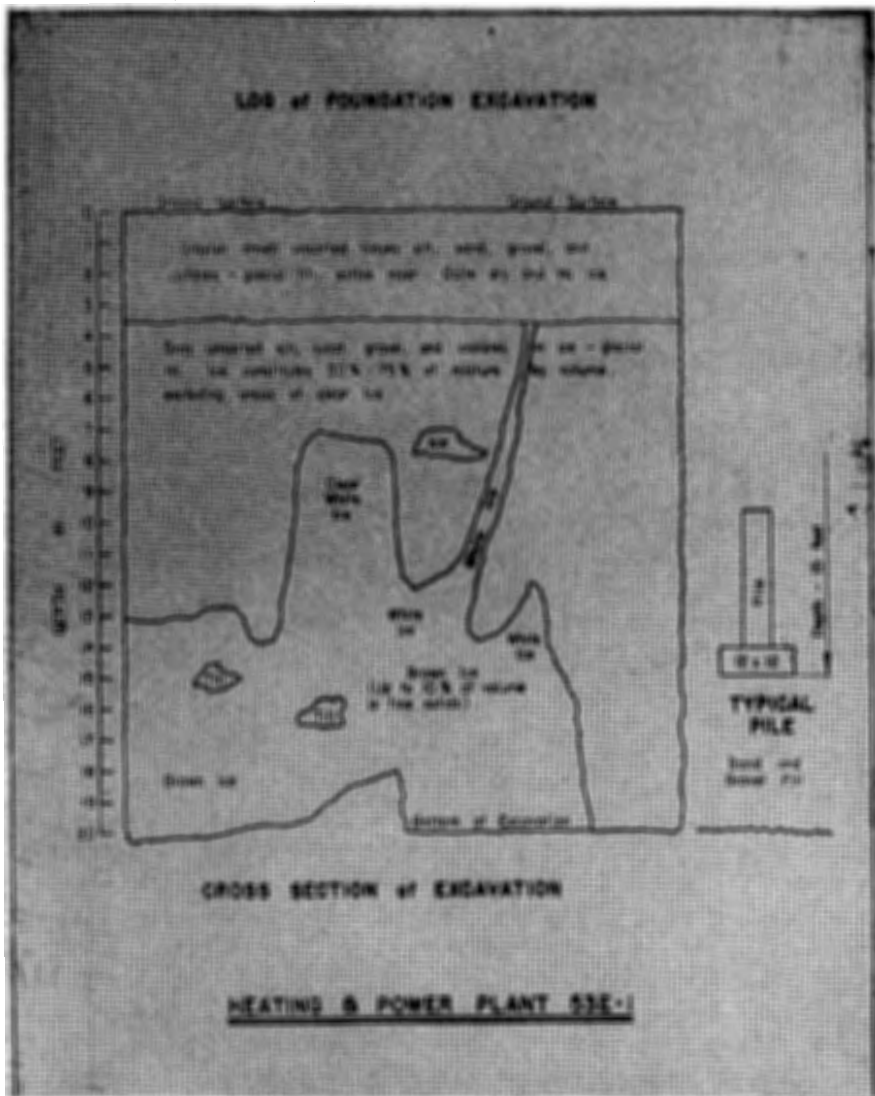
LOG OF FOUNDATION EXCAVATION SHOWING HIGH ICE-CONTENT.
